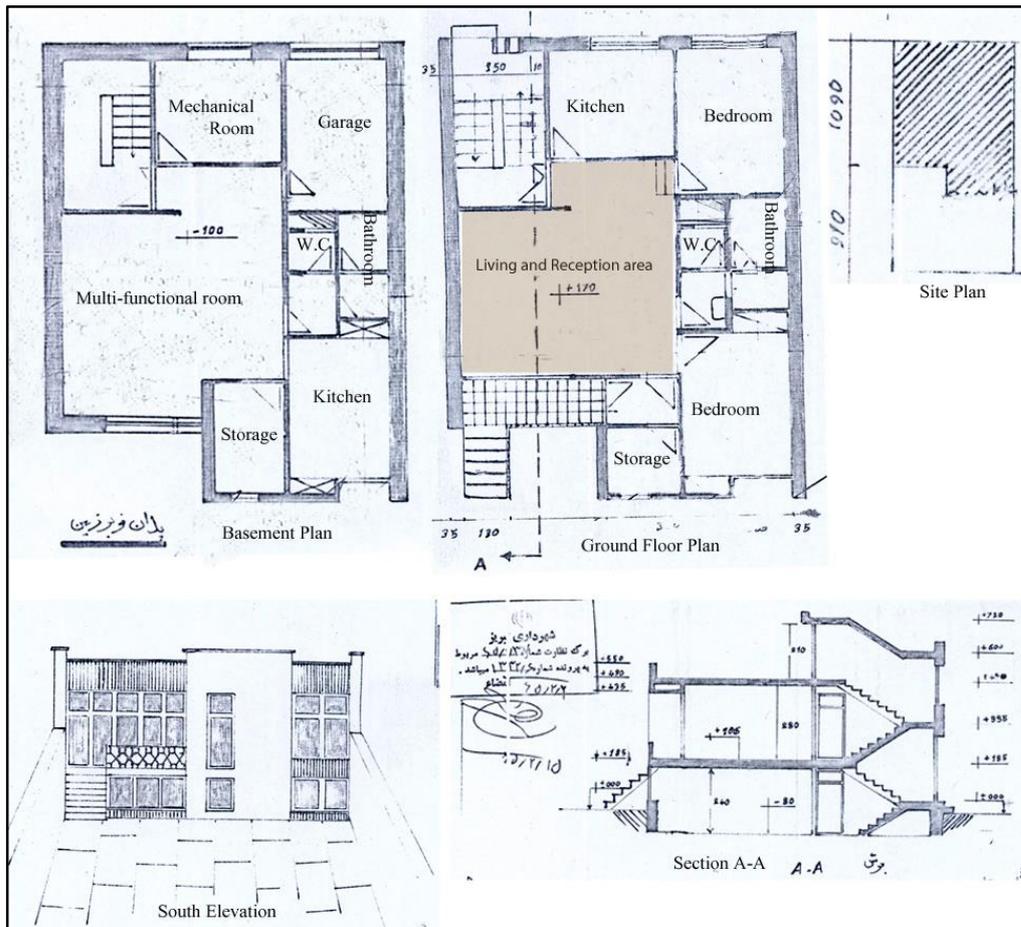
An early open-plan house built in the 1980s; the public rooms (reception room, living room, and dining room) were linked while the kitchen, the bedrooms, and the bathroom retained their separate identities. source: (Tabriz municipality archive)
